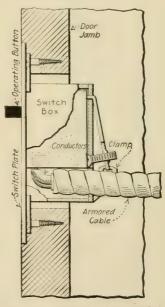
Showing a door switch installed in a door jamb and the method of securing an armored cable to the switch box. (Catalog Nos. 7240 and 7241, Cutler-Hammer Mfg. Co.)
